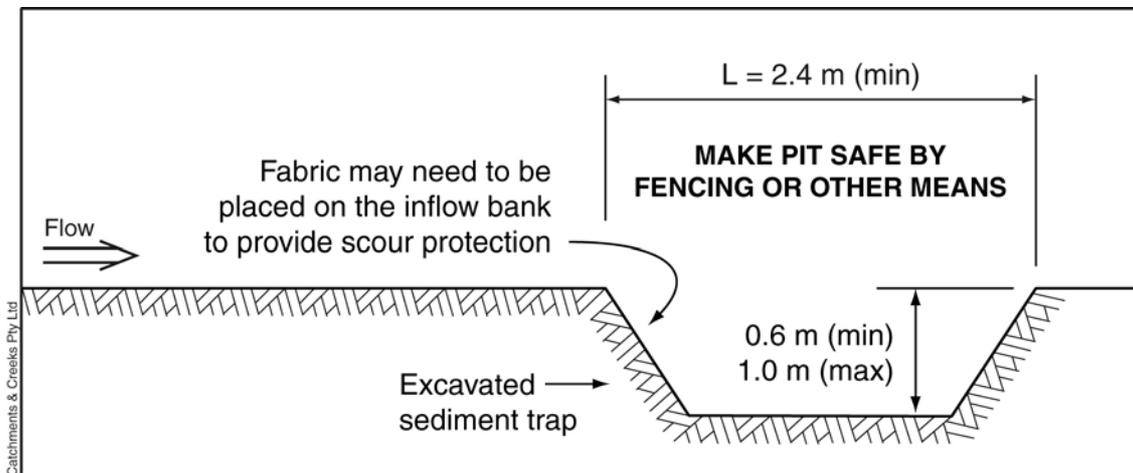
Minimal dimensional requirements of excavated sediment trap located within a minor drainage path
